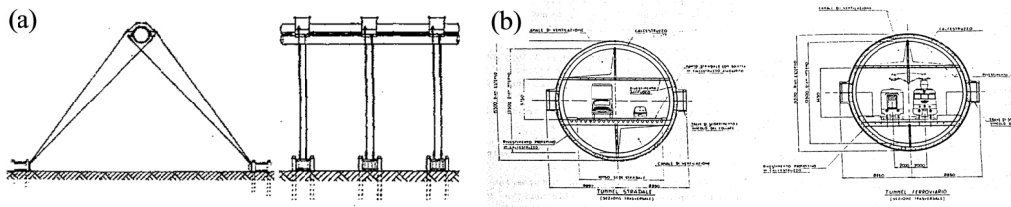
SFT proposal for the Messina Strait crossing by ATI-SSST (1989): (a) anchoring system set-up (b); tunnel cross-sections.
